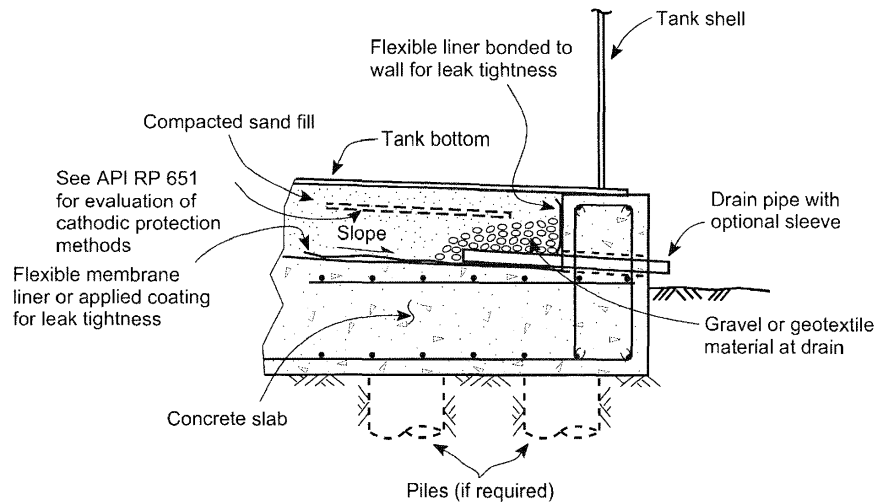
Reinforced Concrete Slab with Leak Detection at the Perimeter (Typical Arrangement)
